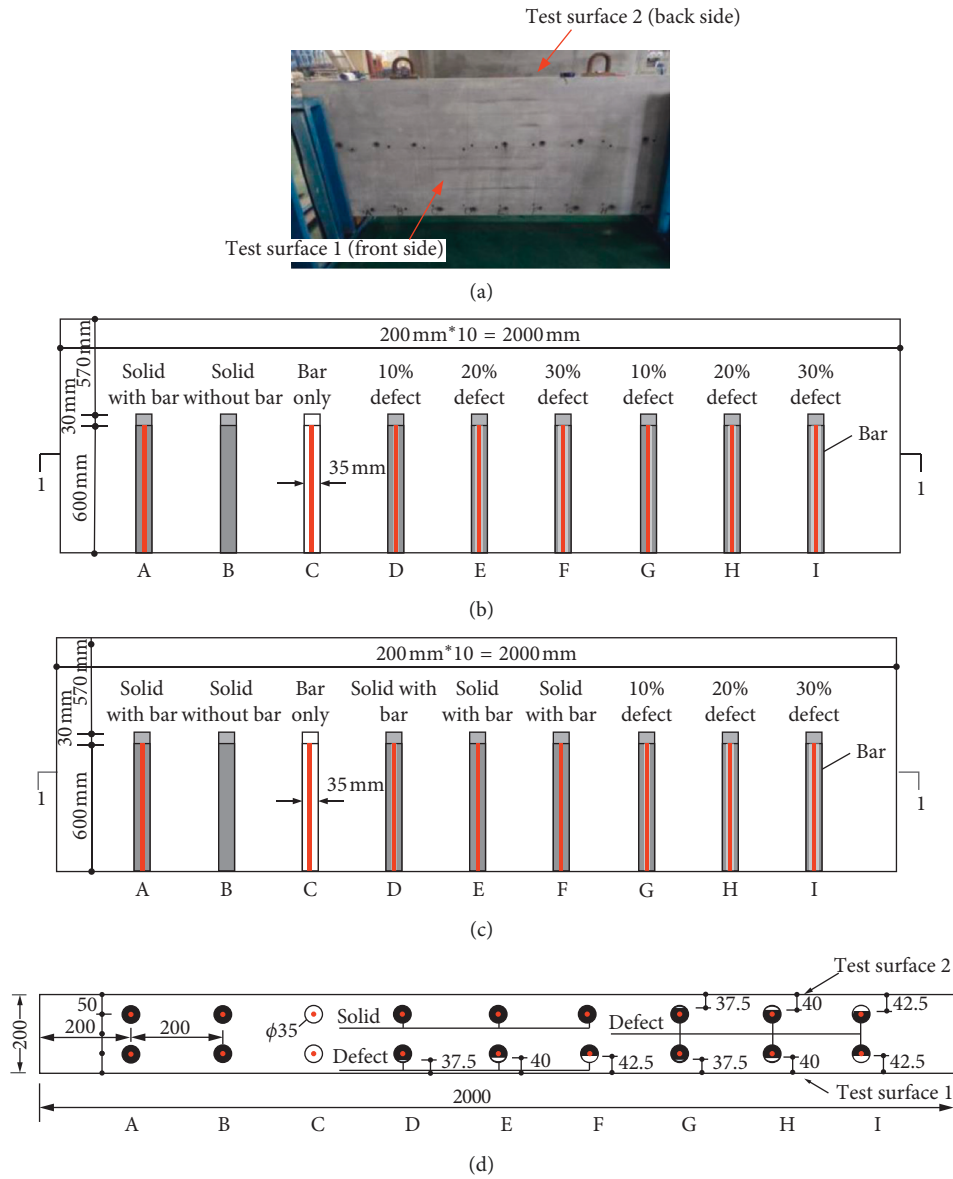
Details of the shear wall test specimen. (a) Photo of the test specimen. (b) Details of test surface 1. (c) Details of test surface 2. (d) Section 1-1.
